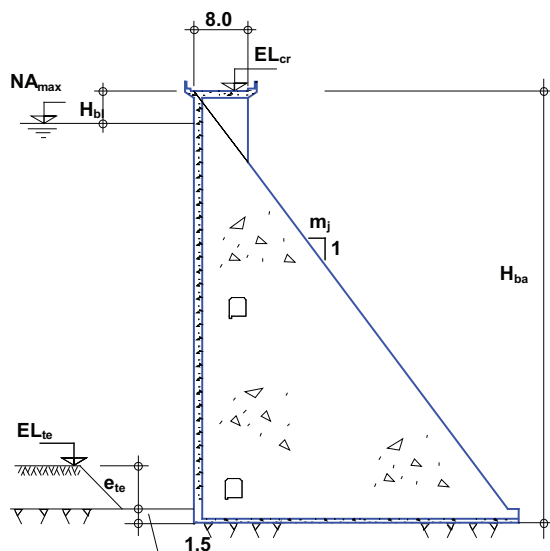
Typical cross-section of a roller compacted concrete dam.
